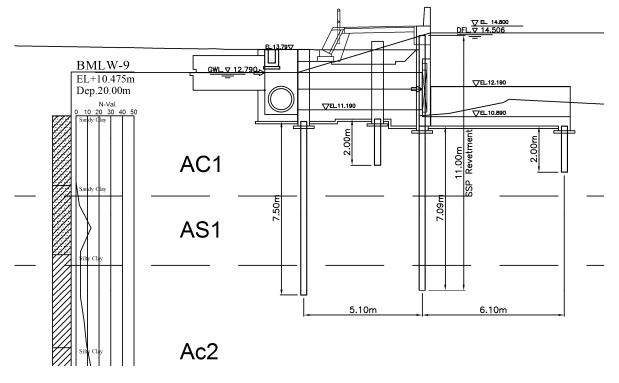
Length of SSP Cut off Wall (4/9) (MSL-4)
